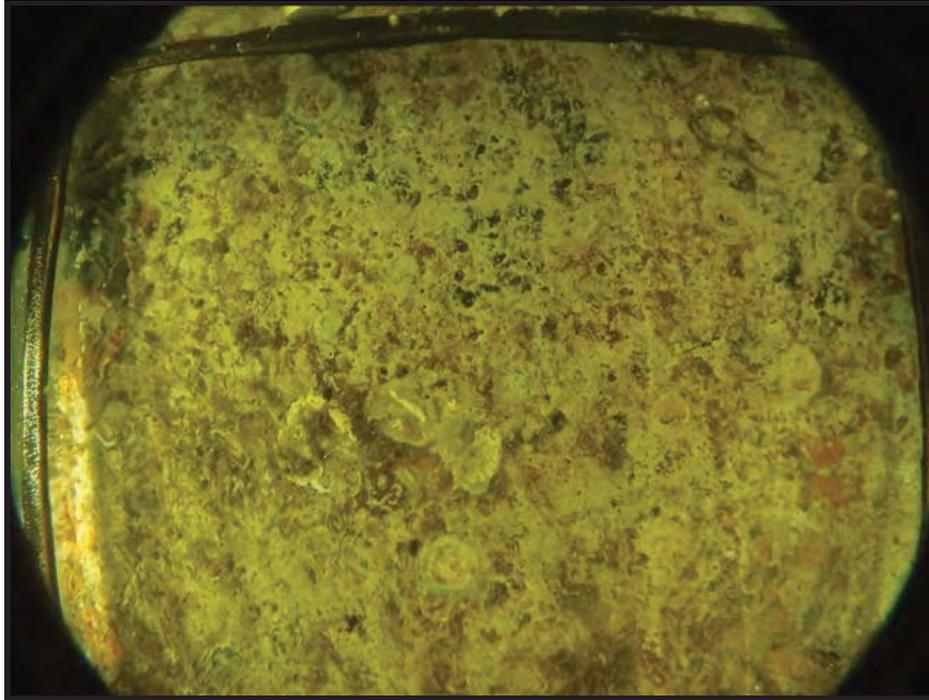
Typical condition of a vertical concrete pile below water.
